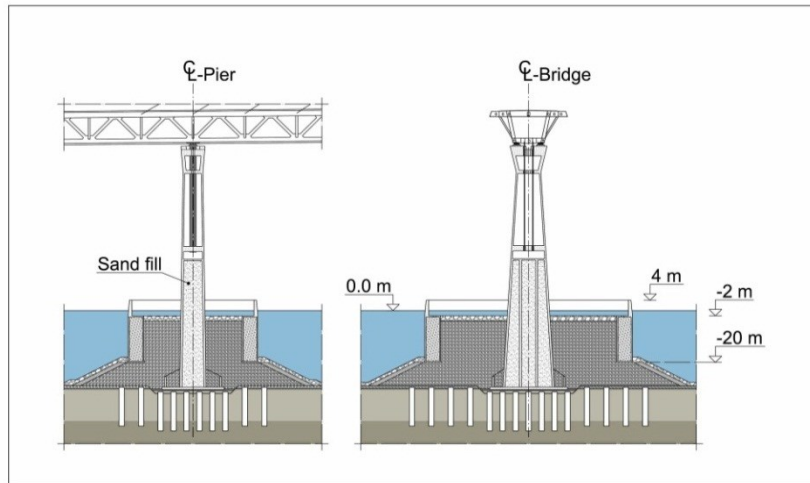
Conceptual design of a cable-stayed bridge – Schematic diagram of a section of the centre pylon's caisson
